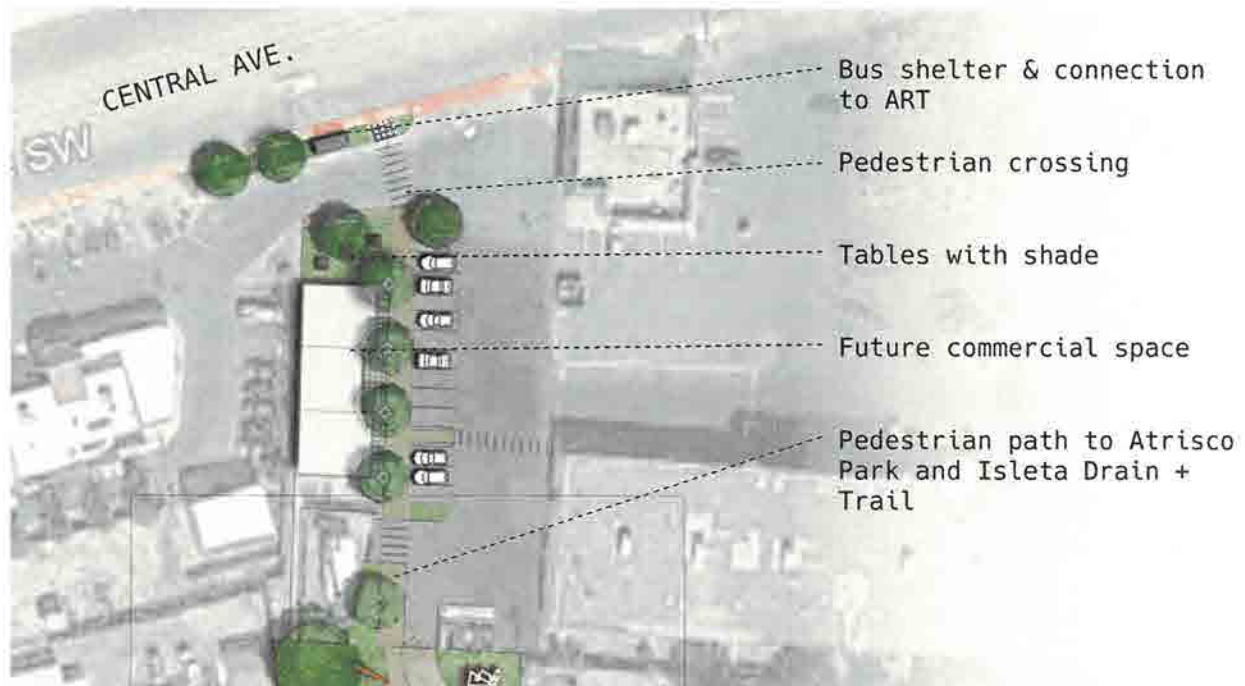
NORTH GATEWAY TRAILHEAD - CONNECTION TO CENTRAL AVE.
